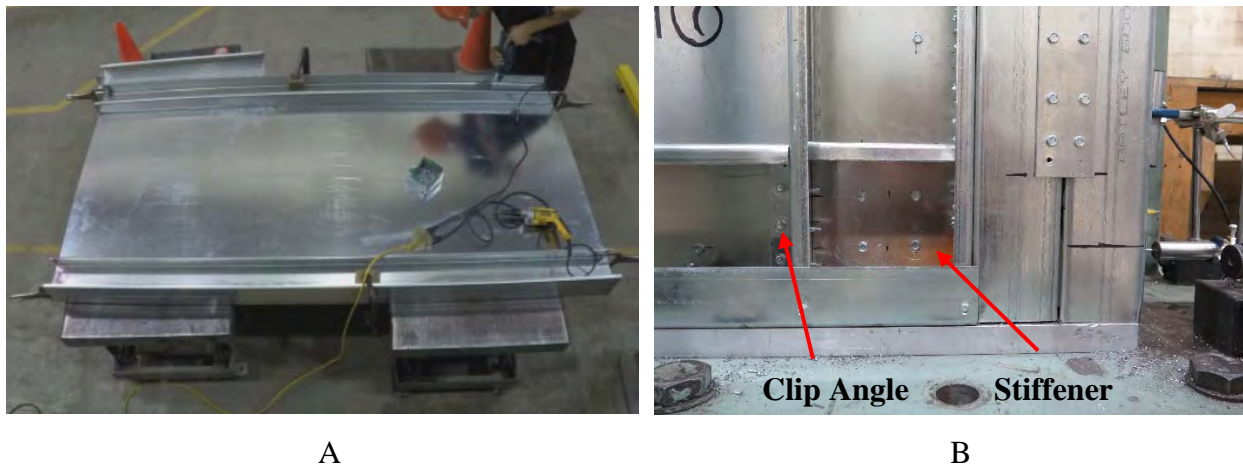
A) Chord stud assembly of a centre-sheathed specimen. B) Stiffener installed at the bottom right corner of the wall.
